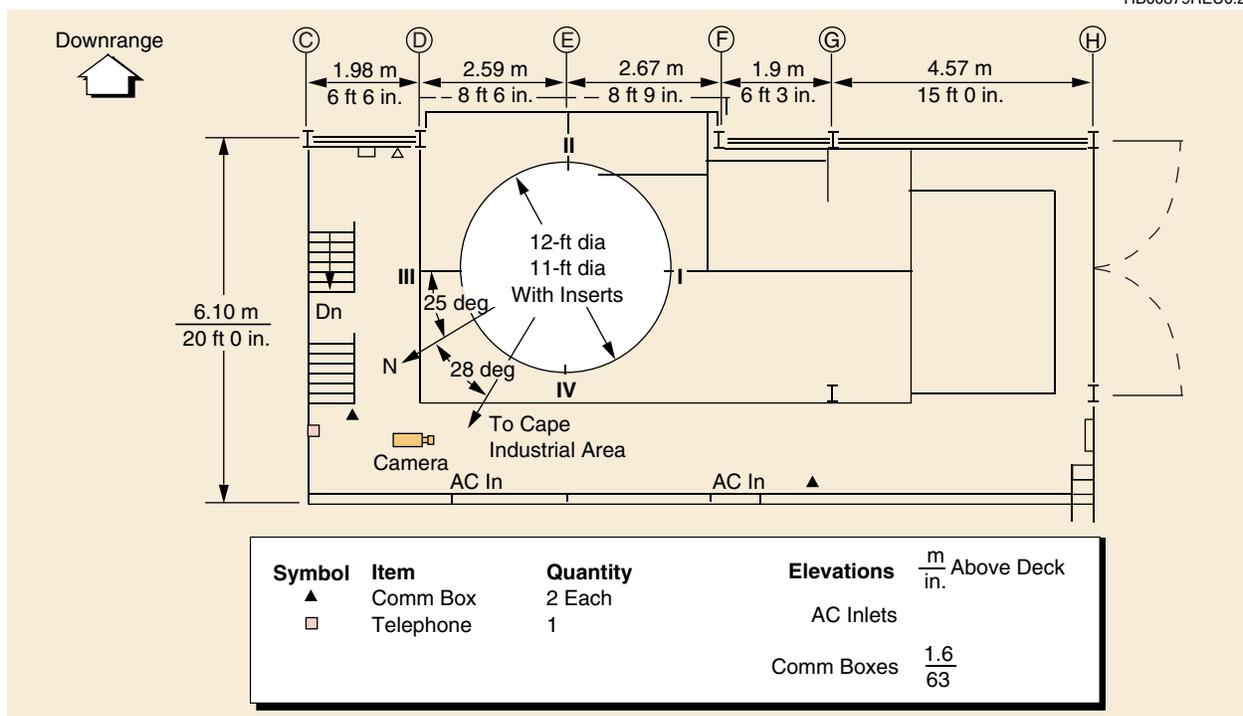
B. Level 9C Floor Plan, Pad 17B
